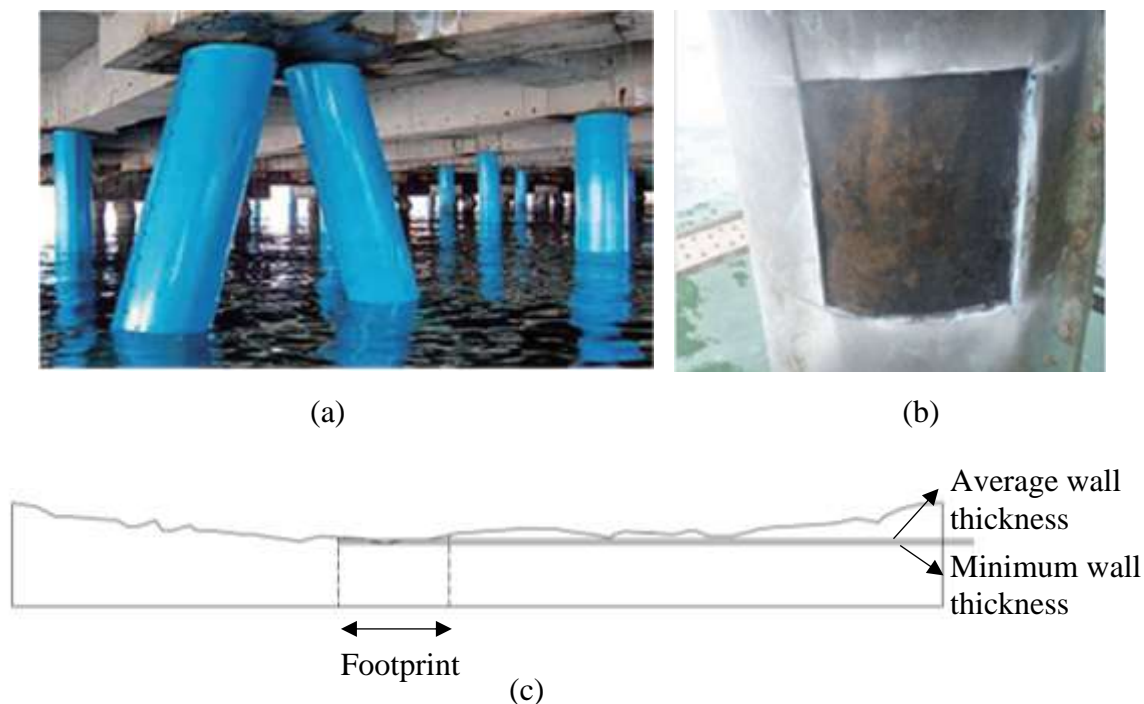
(a) Steel pipe piles used as the foundation in offshore structures with protective FRP over, (b) Corrosion under protective Titanium cover [17], and (c) Irregular wall loss occurring in Corrosion Under Insulation (CUI) [18].
